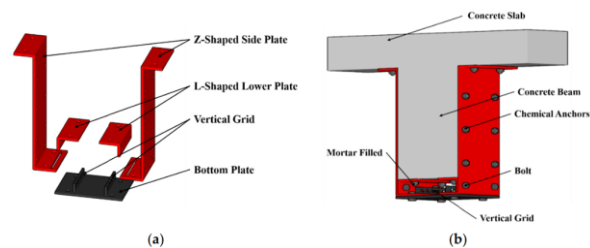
Modular structural components used for strengthening the beam specimens in study [30]
